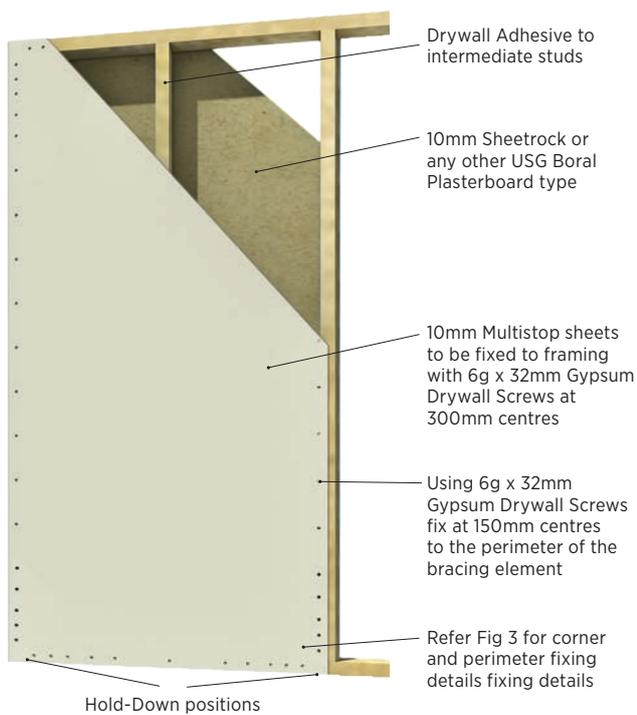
UBSM BRACING SYSTEM WITH SHEETS INSTALLED HORIZONTALLY
